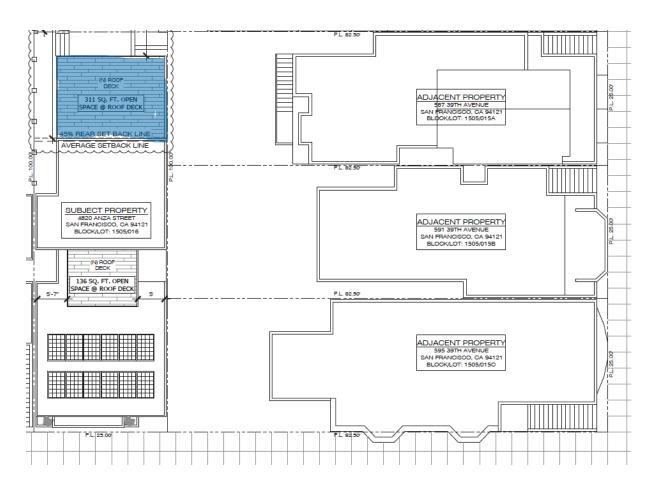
Remove Proposed 4th Floor and Rear Roof Deck
